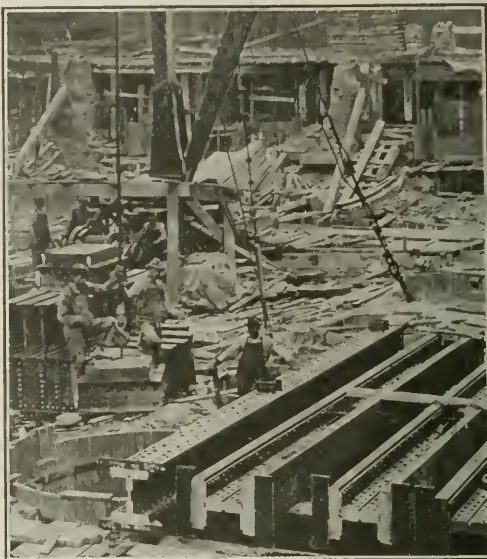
HEAVY COLUMN SECTIONS AND GRILLAGE
